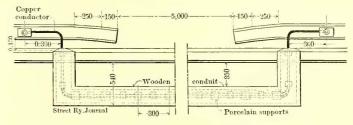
METHOD OF ELECTRICALLY CONNECTING THIRD RAIL AT CROSSINGS
